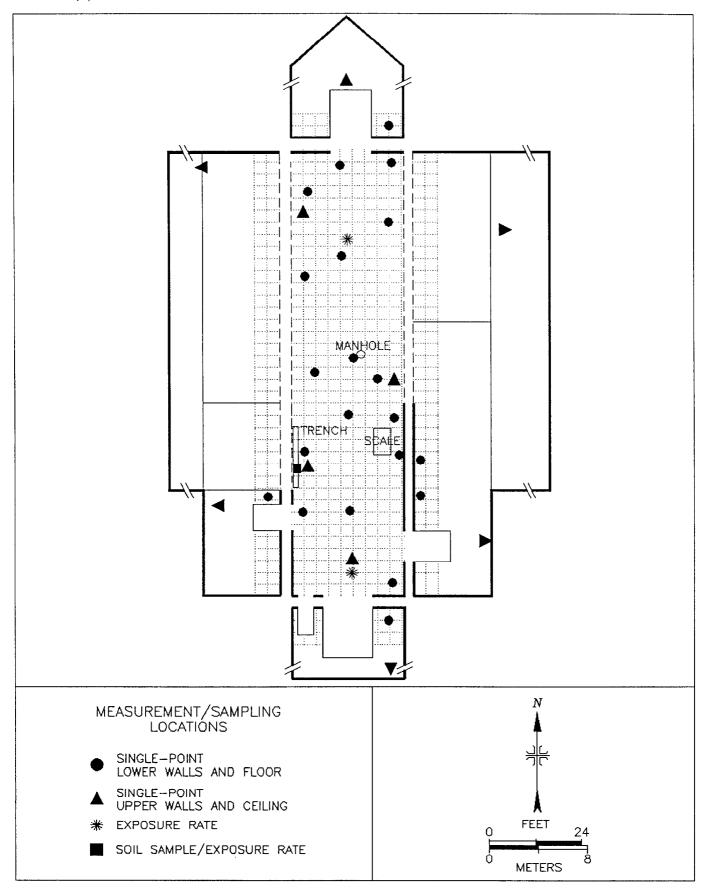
North Building, West Corridor - Measurement and Sampling Locations
